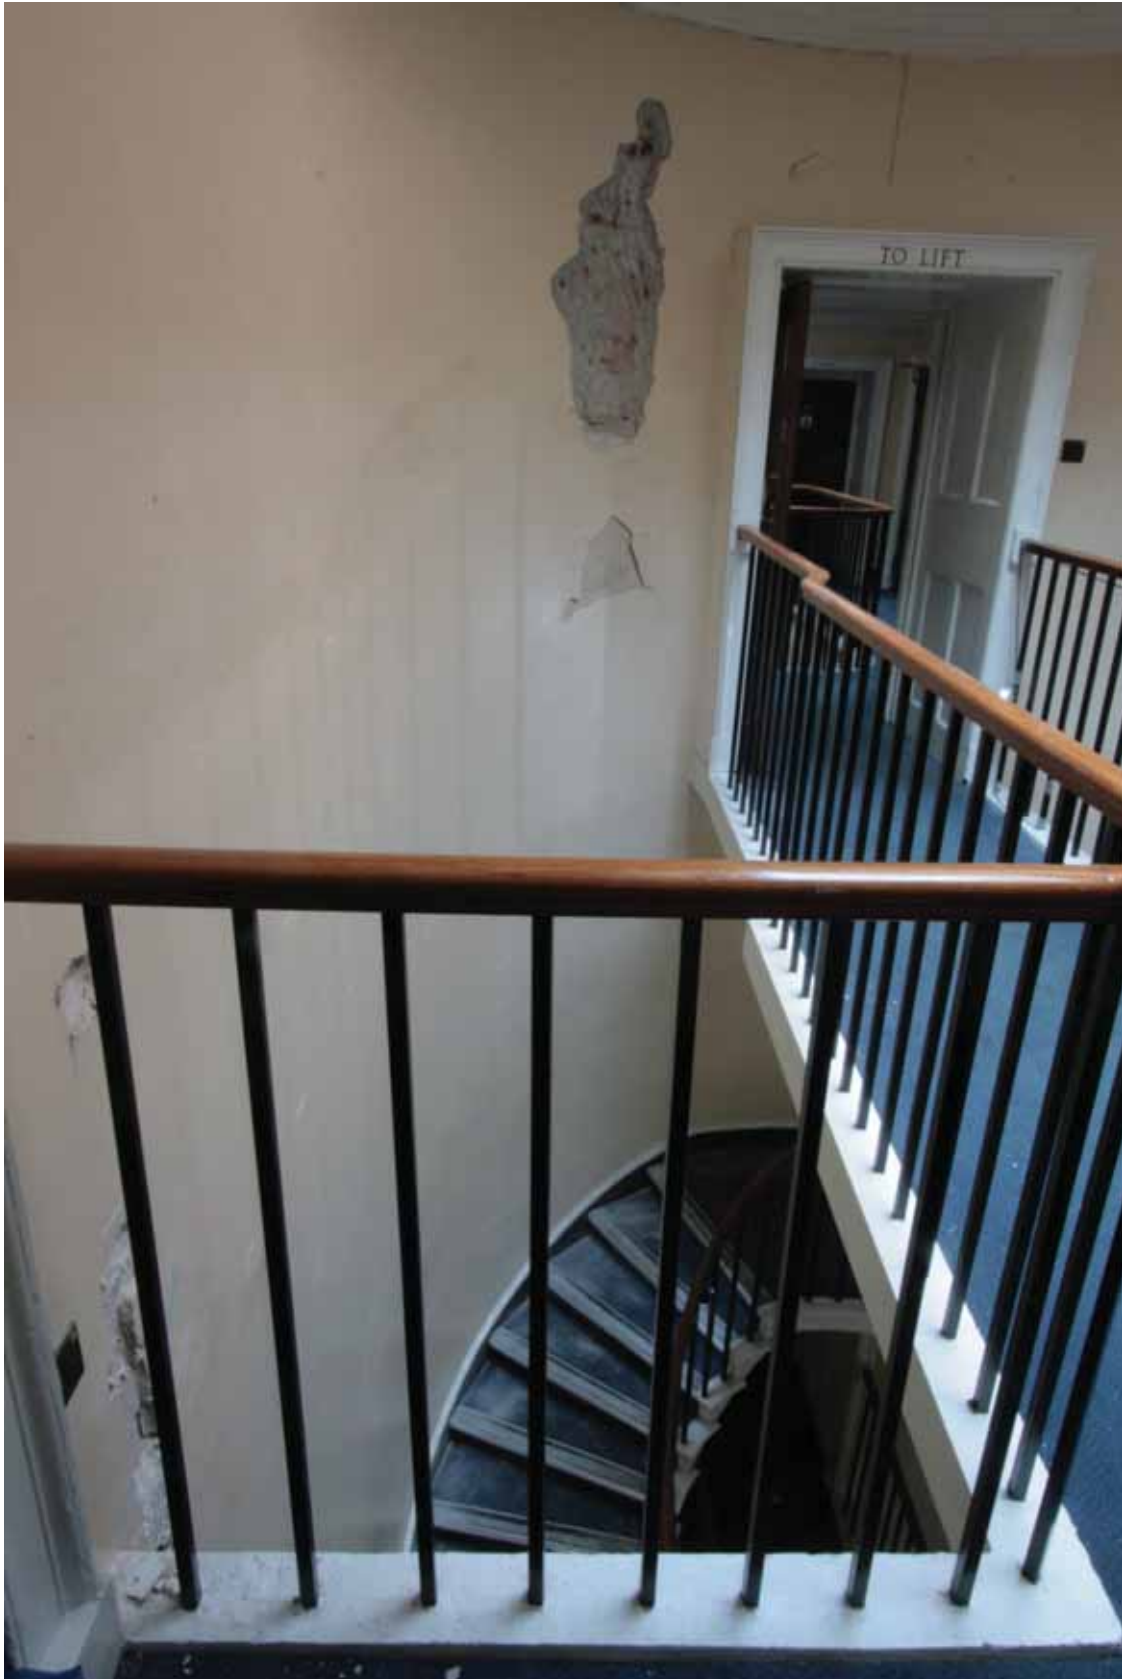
Link bridge in Stairs 02S looking north (EAF10 0132)
